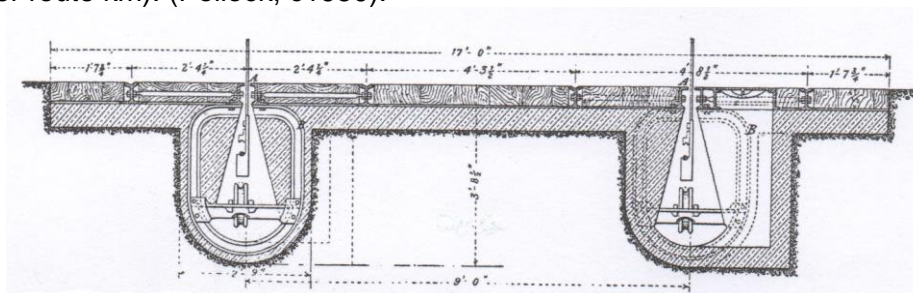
Typical Track cross-section. Shows line sheave access pit on right-hand side.
